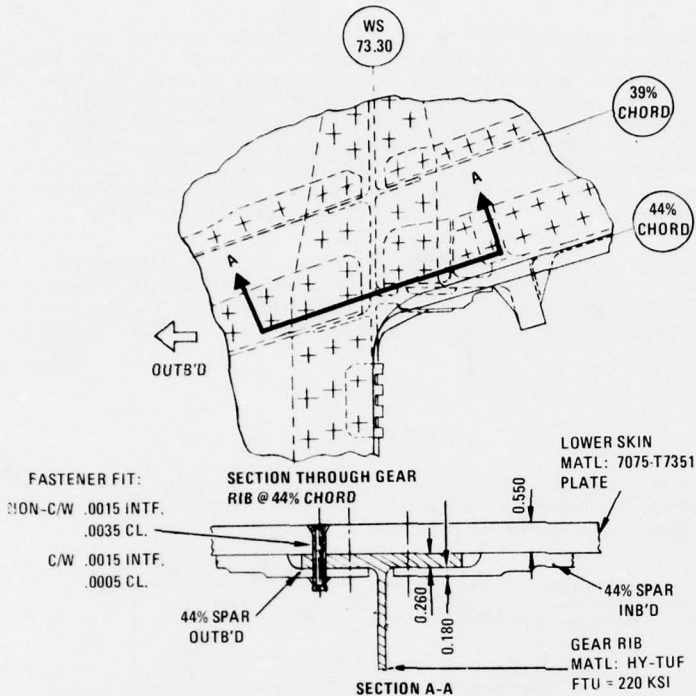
A. FATIGUE-CRITICAL LOCATION ON WING LOWER SKIN AT GEAR RIB
